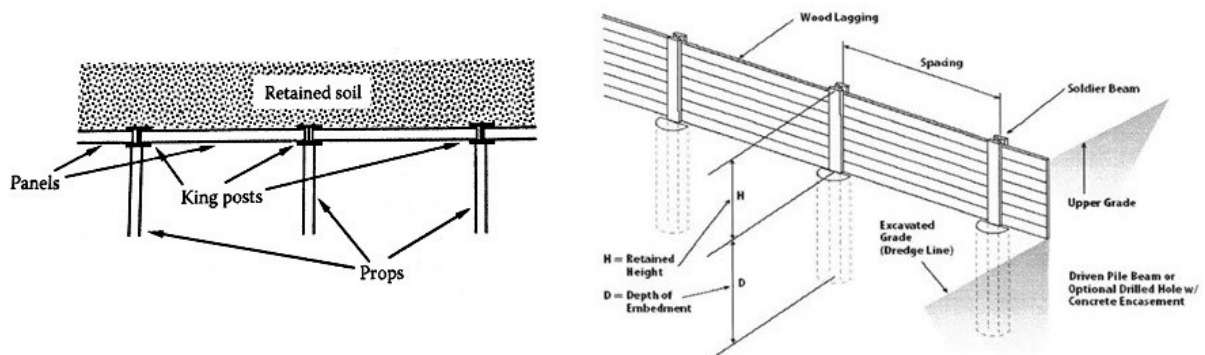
Plan of King post wall showing steel H-piles and concrete or wood panels
